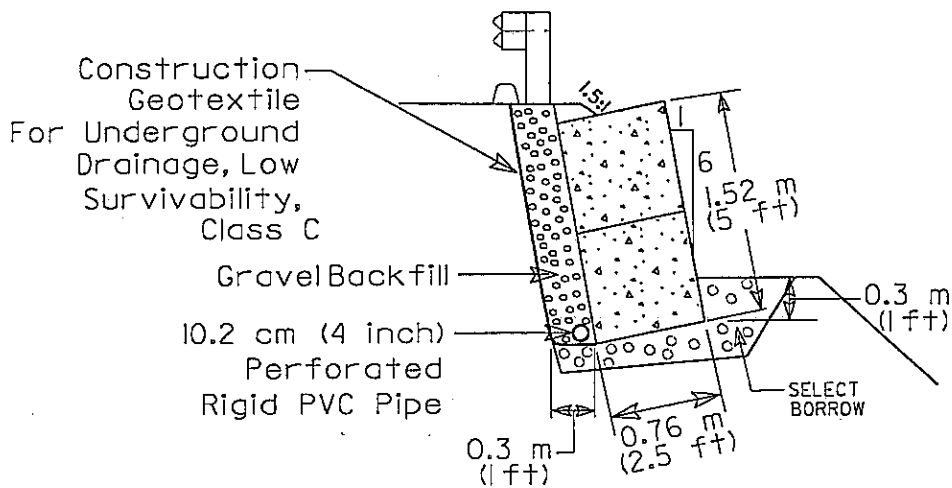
CONCRETE MODULAR BLOCK WALL
